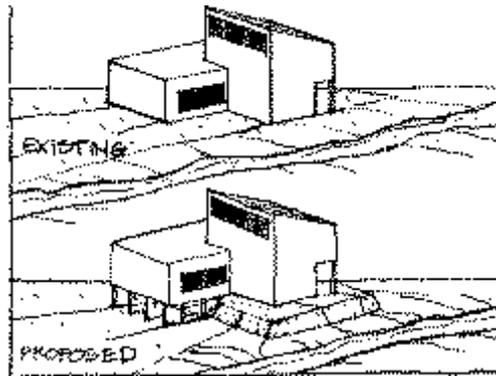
Elevate structure above flood level (Federal Emergency Management Agency (FEMA). 2014).
